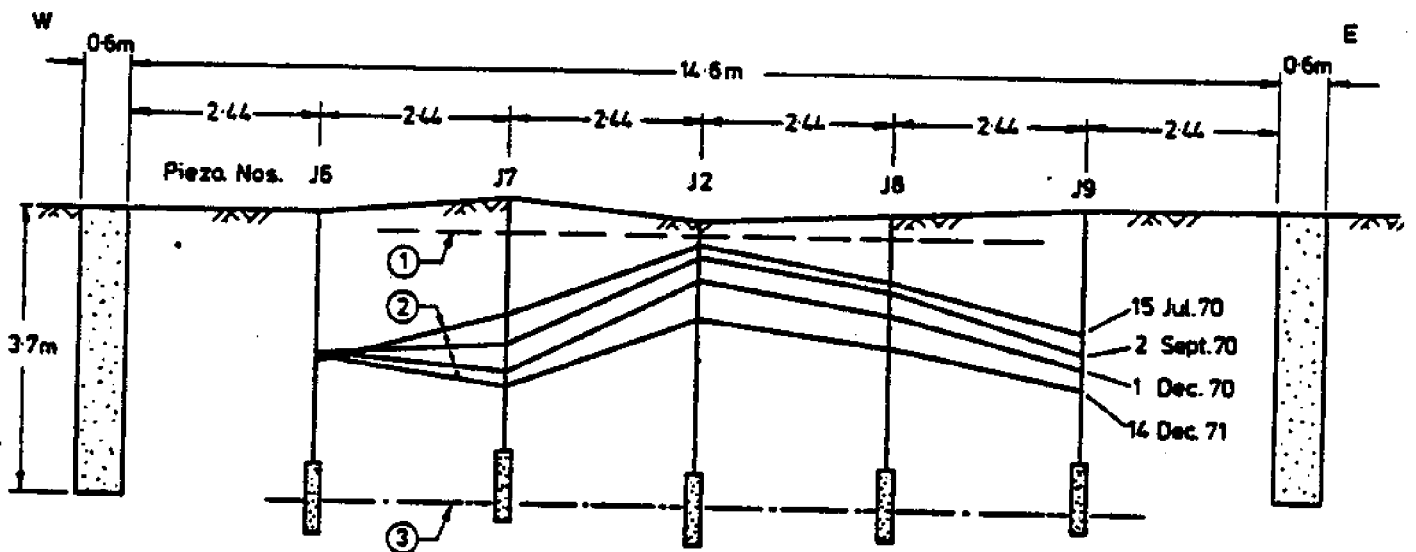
Cross-section of trench drain installation at Burderop Wood, Wiltshire, showing the effects of drainage at various times after installation (after Skempton, 1972).
